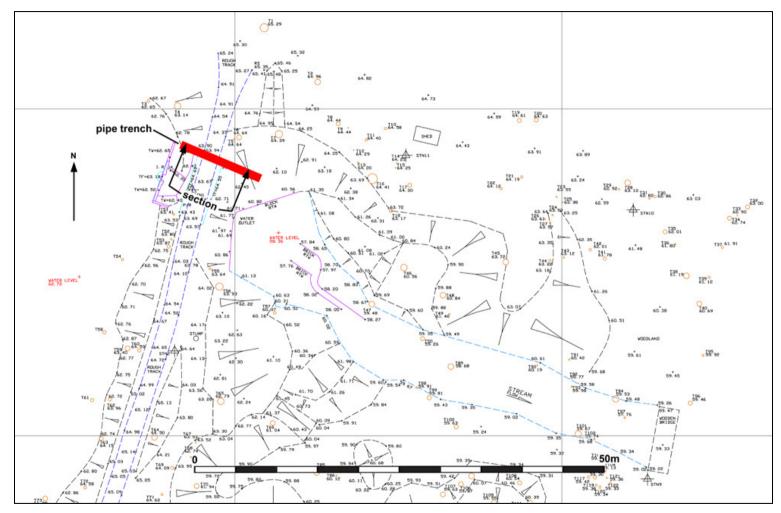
Topographical plan showing the location of the pipe trench through the dam and the drawn section.
